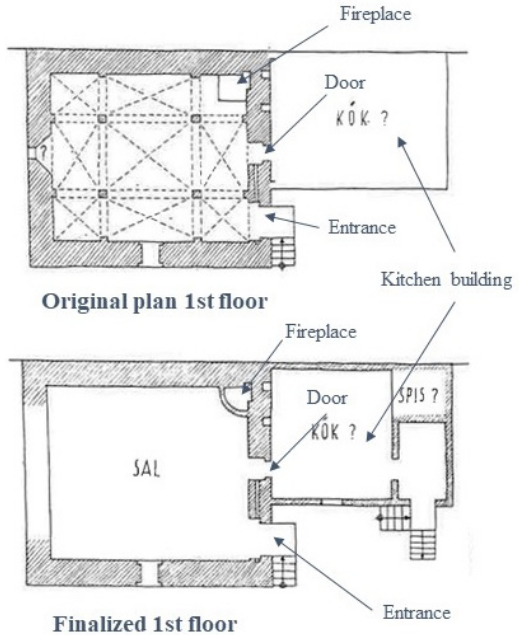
The Thott House, reconstruction of the 1st floor. (Anderson 1964, 30).
